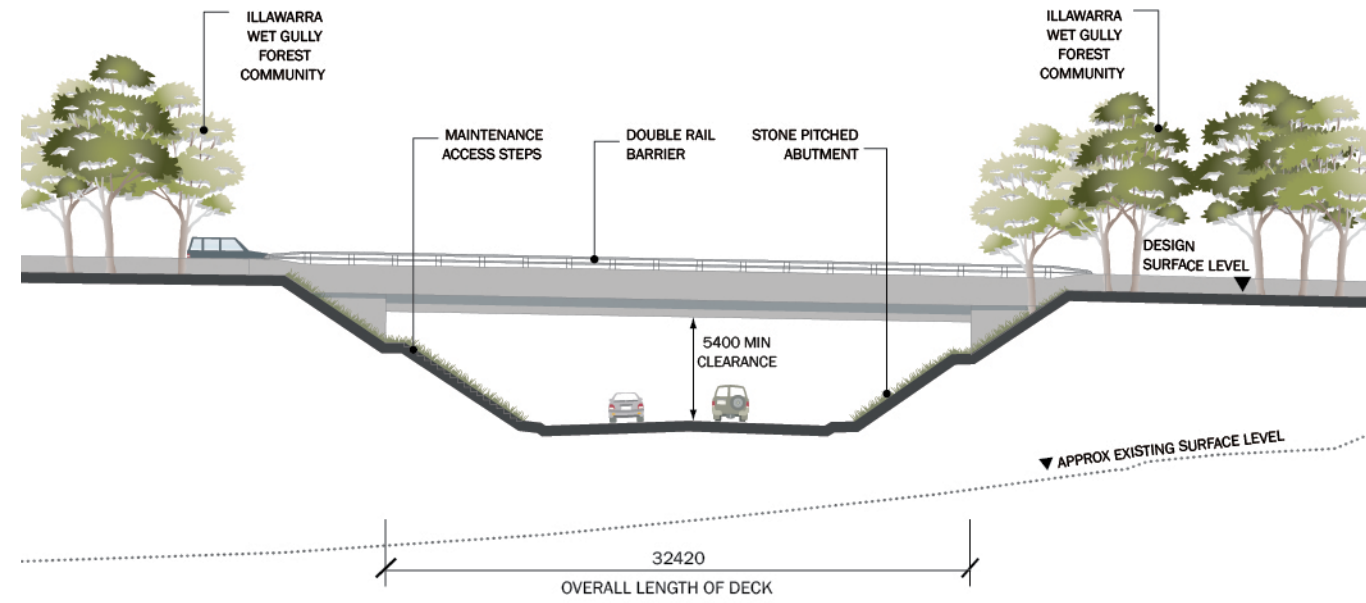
Elevation – Bridge SB05: Austral Park Road Underpass
